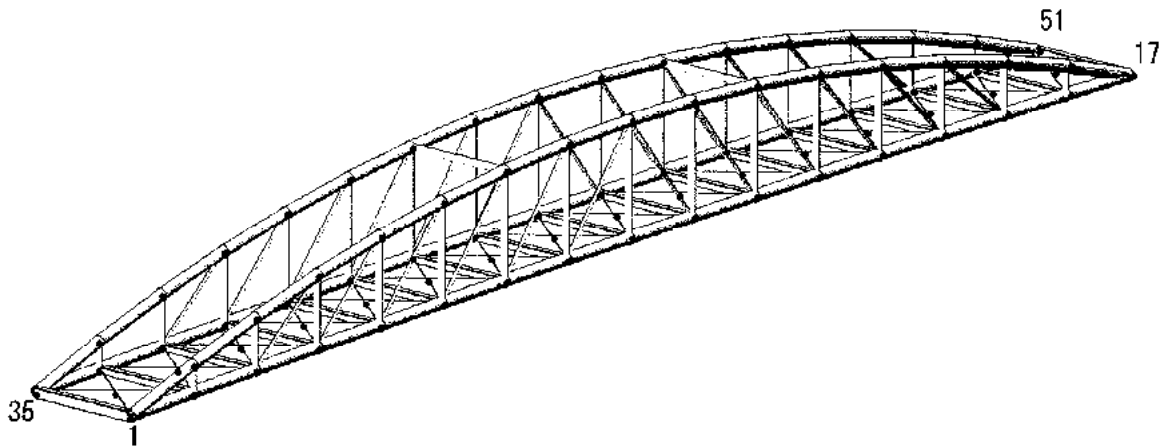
Footbridge Cap Nord – Iso view of the truss general model
